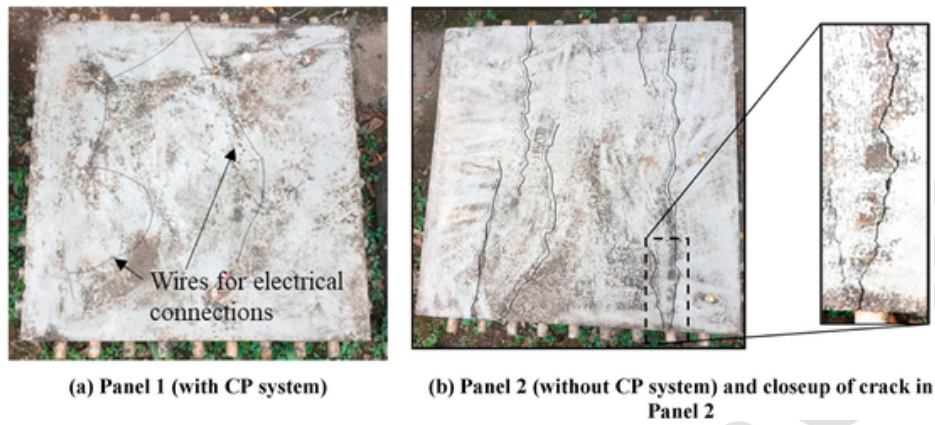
Photograph showing the condition of the panels after 12 years of exposure. Panel 2 shows severe corrosion (a) Panel 1 (with CP system) (b) Panel 2 (without CP system) and closeup of crack in Panel 2.
